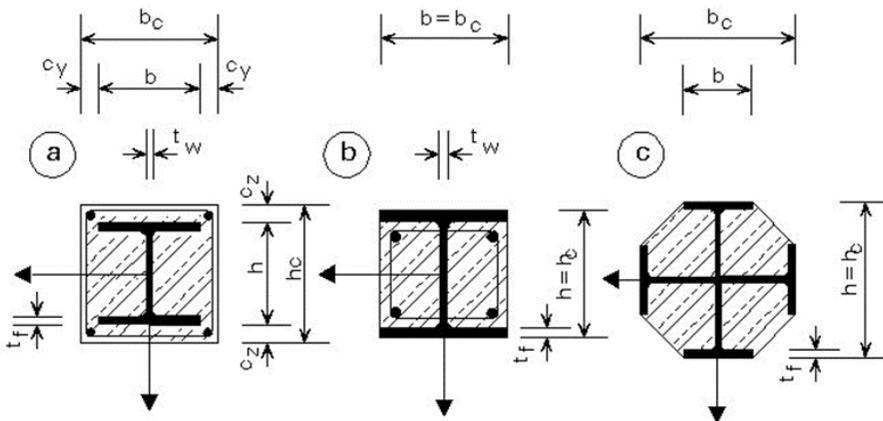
Composite Columns Types, a) Steel Section Fully Enchased with Reinforced Concrete, b) Steel Section Partially Enchased with Reinforced Concrete, c) Steel Section Partially Enchased with Concrete [70]
